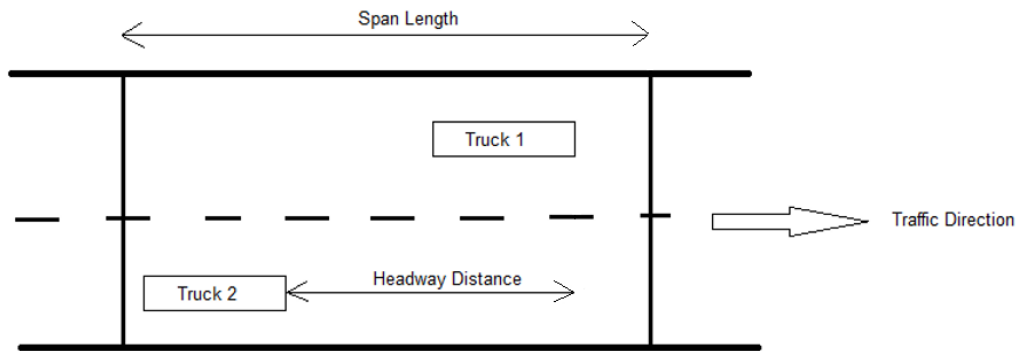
Headway distance between two trucks on the same bridge span.
